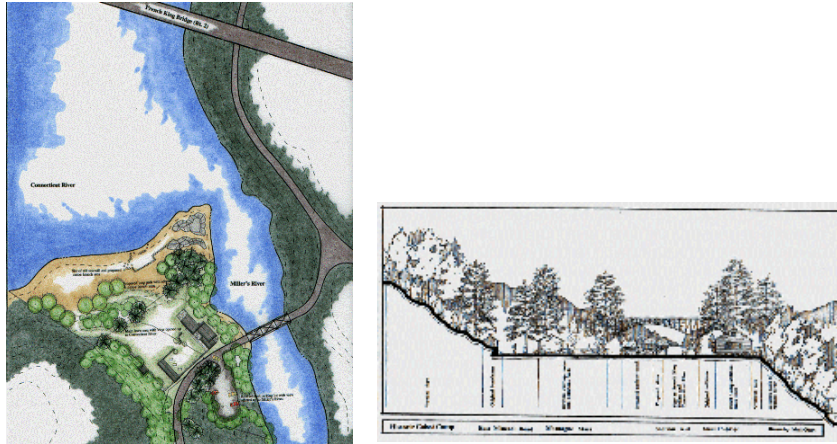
The Site Plan and Section for Cabot Camp, MA (Fabos, 2004)
